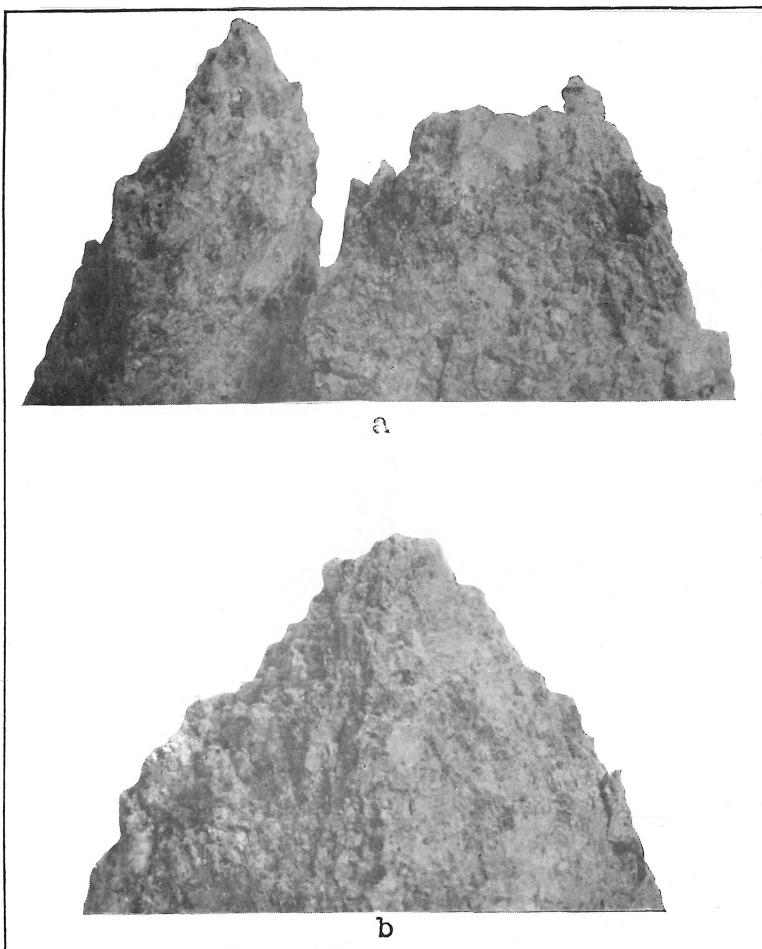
Shape of fragments after crushing heated cubes. Slightly enlarged.
